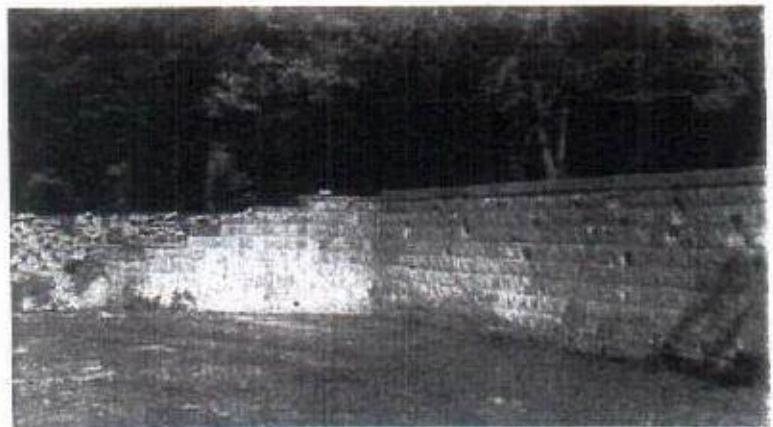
CURVED RANDOM STONE WALL AND STEPS
